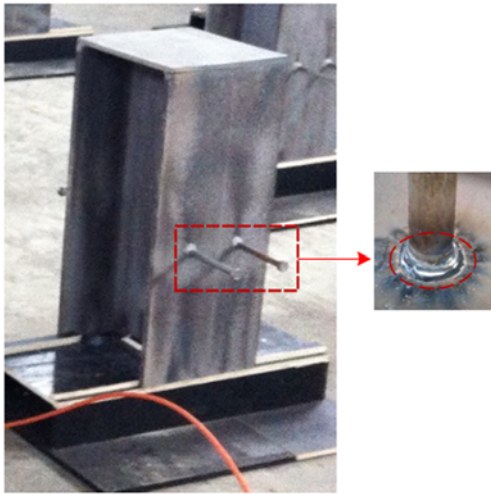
Finished Welding Products of Steel Beams and Stud Connectors
